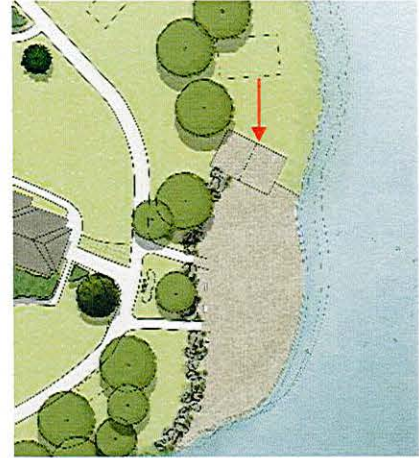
Low stone wall edge around beach area and relocation of beach volleyball
